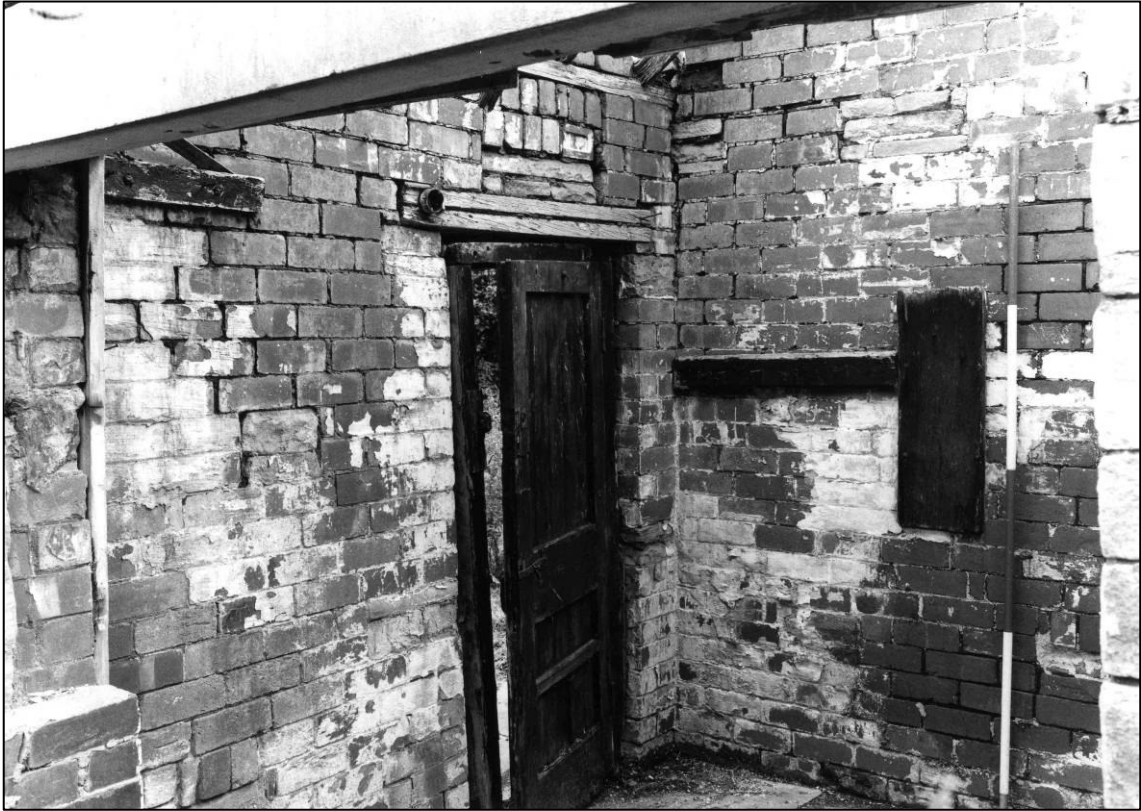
Building N1, interior west cell, looking NE (photo 1/13).
